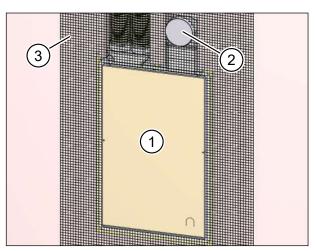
Plastering the installation kit and flat ductwork / flexible pipes on the inside
